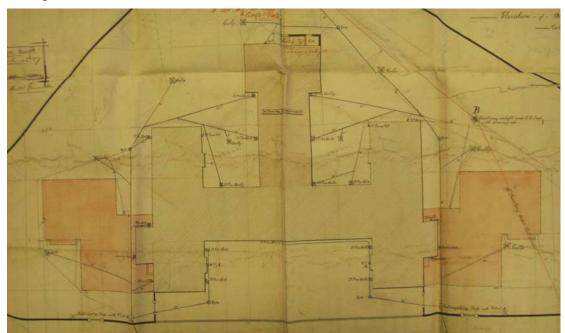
Plan of 1887 showing proposed additions to north-east and south-west wings (CRO(B) Z1041 1875-1904)
